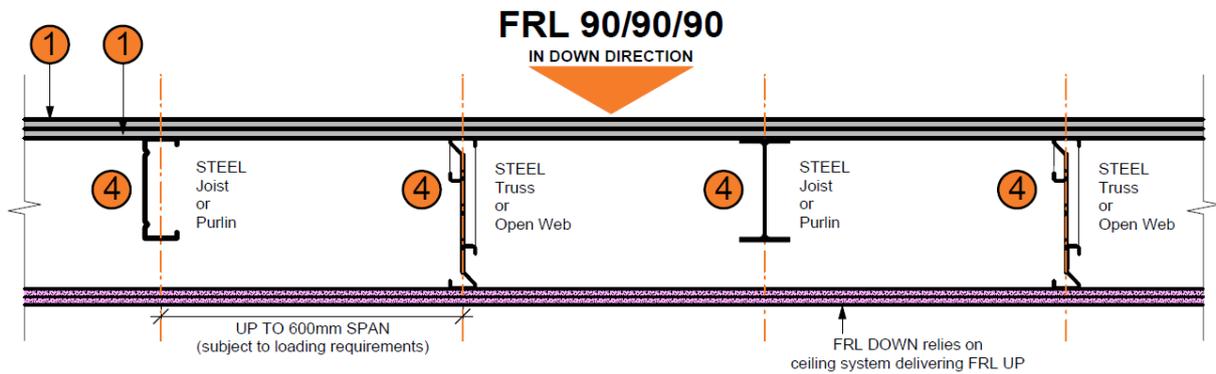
Steel frame floor/ceiling System with 2 × 19 mm INEX>FLOOR19
